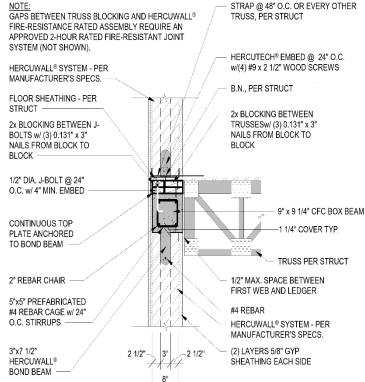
2-hr Load-Bearing Braced (1 Side) CFC Box Beam Wall¹
